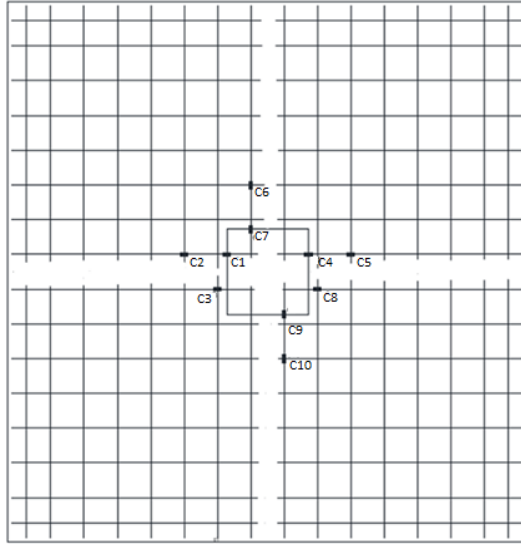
Compression reinforcement strain gage layout for 1.0% reinforcement ratio
